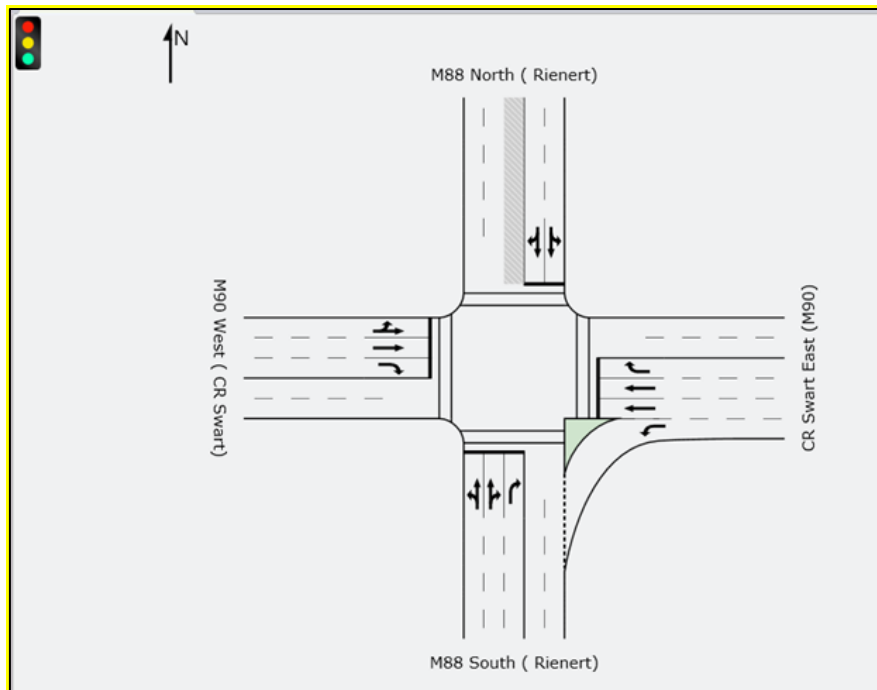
M88 (Rienert Avenue) and M90 ( C.R Swart Drive) intersection layout
